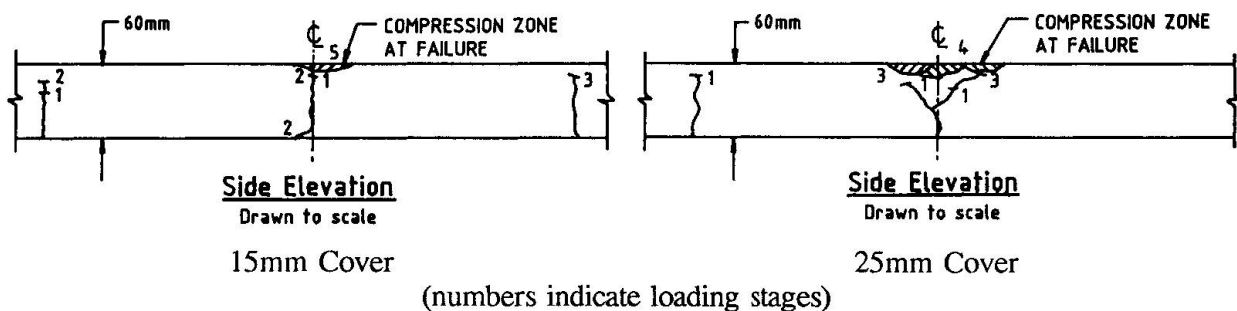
Cracking Patterns - Impact Loading 60mm Thick Planks
